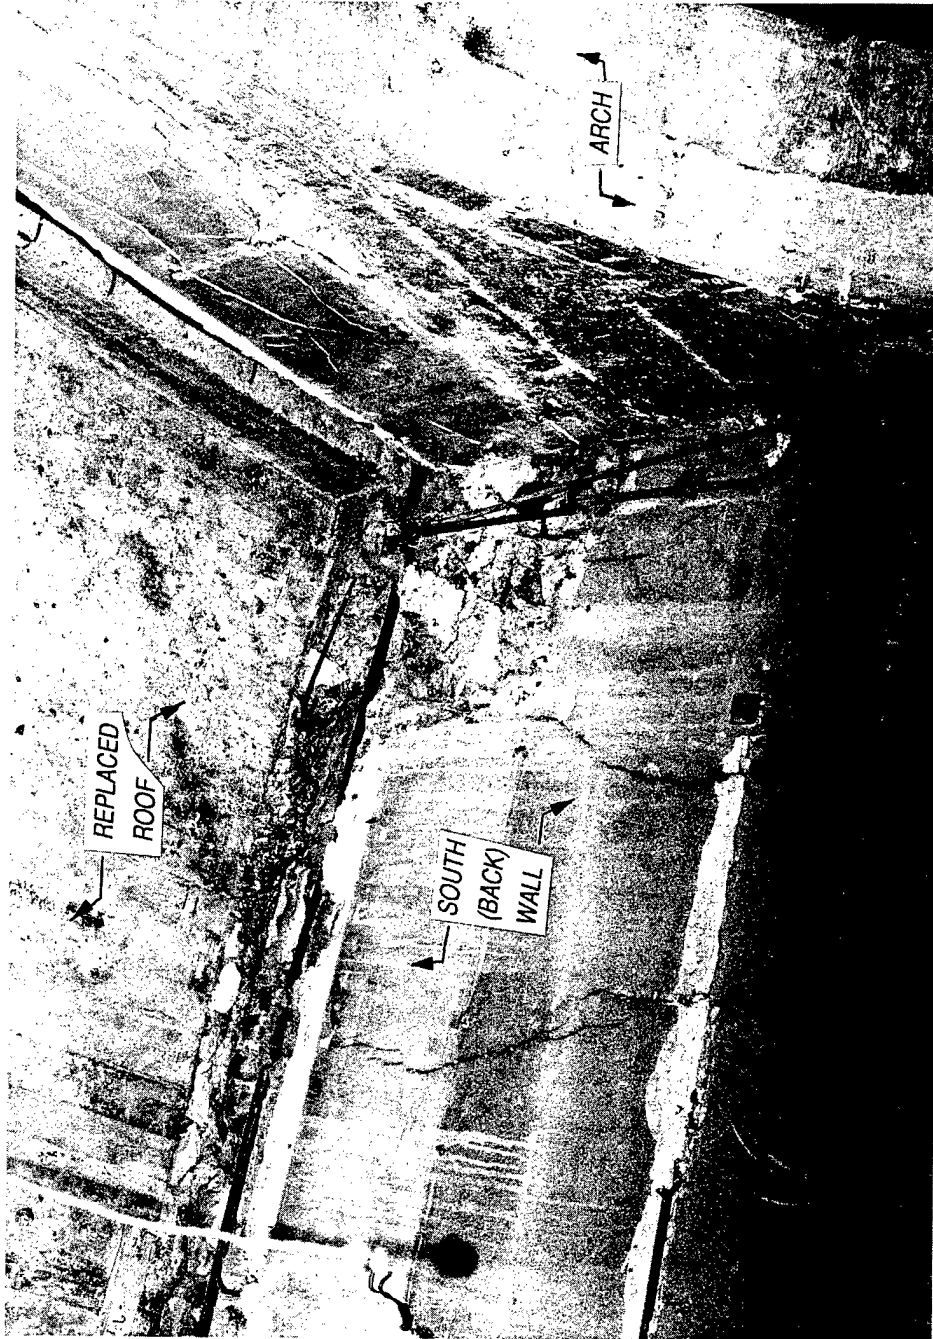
Interior south wall of Saraya el-Adl looking up at contact between wall, arch, and concrete ceiling showing cracks, separation, and distortions
